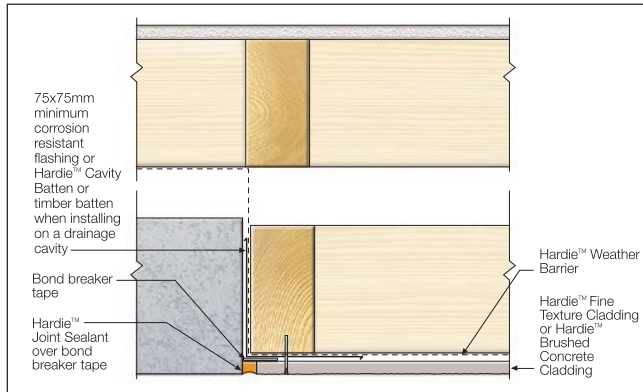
MASONRY (E.G. BRICK) ABUTMENT DETAIL
